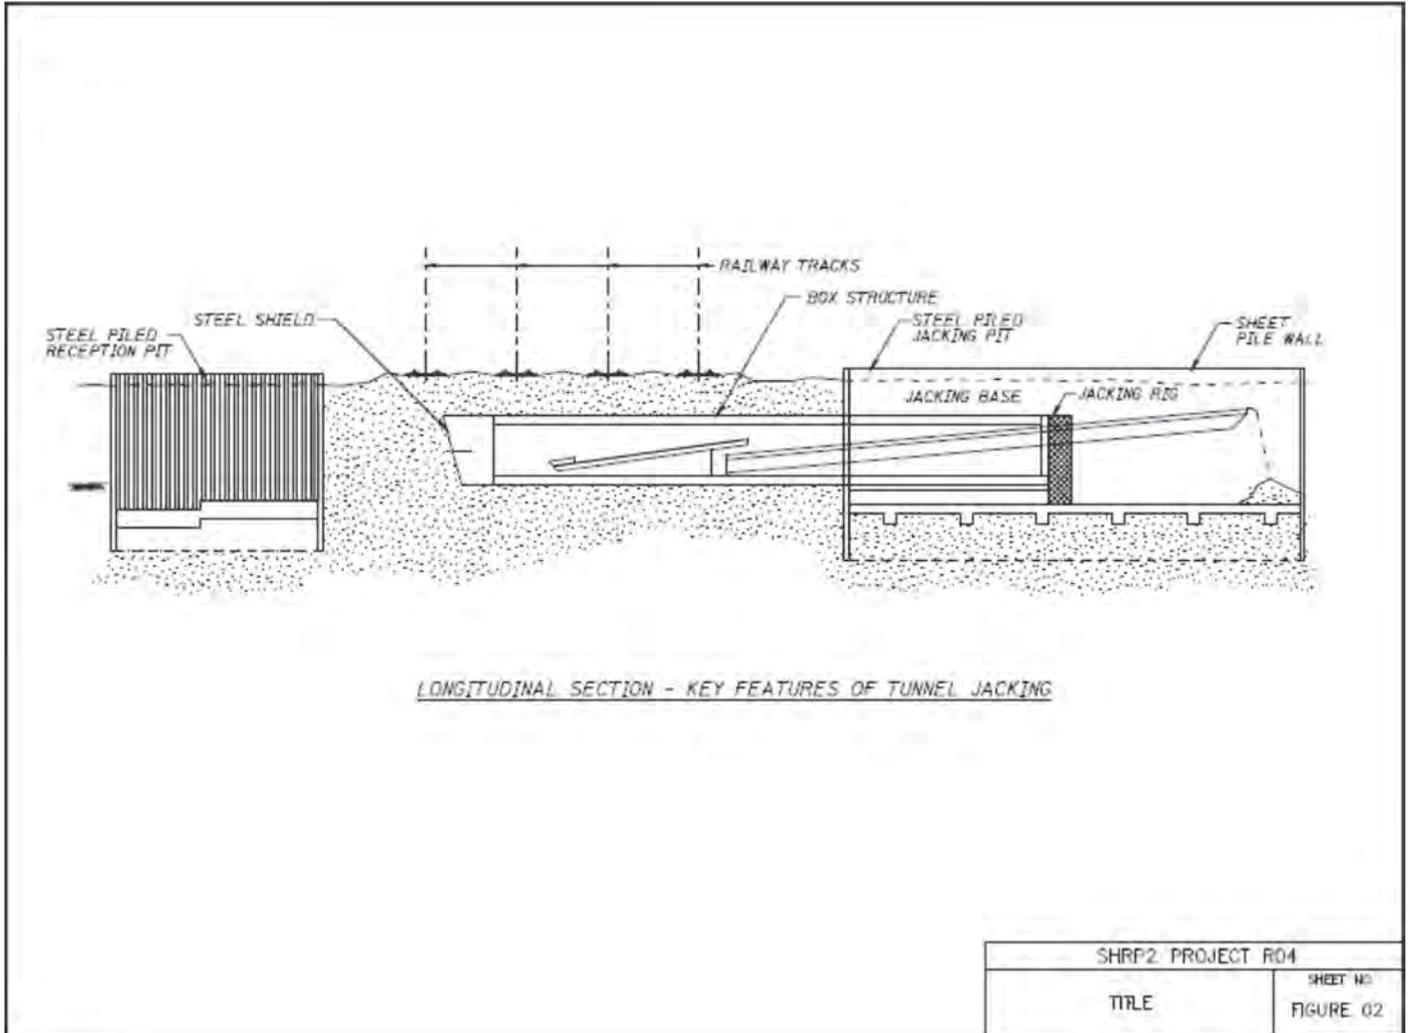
Tunnel jacking, typical longitudinal section, Example B.
